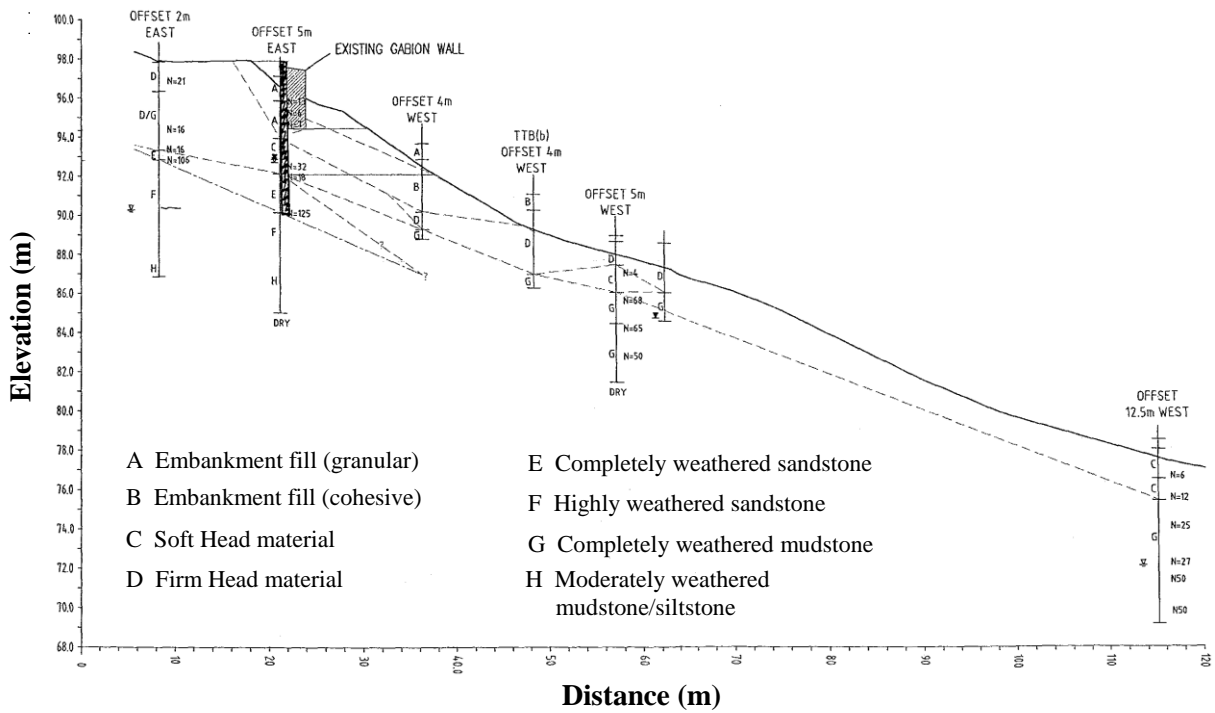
Geological cross-section of the site. Note that the elevation levels relate to a temporary datum and local grid set up near the chapel building.
